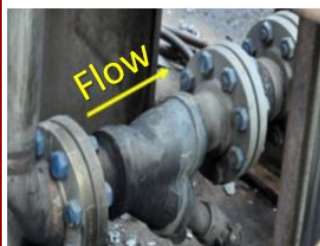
Cast iron Y-strainer improperly installed a welded stainless steel line.
